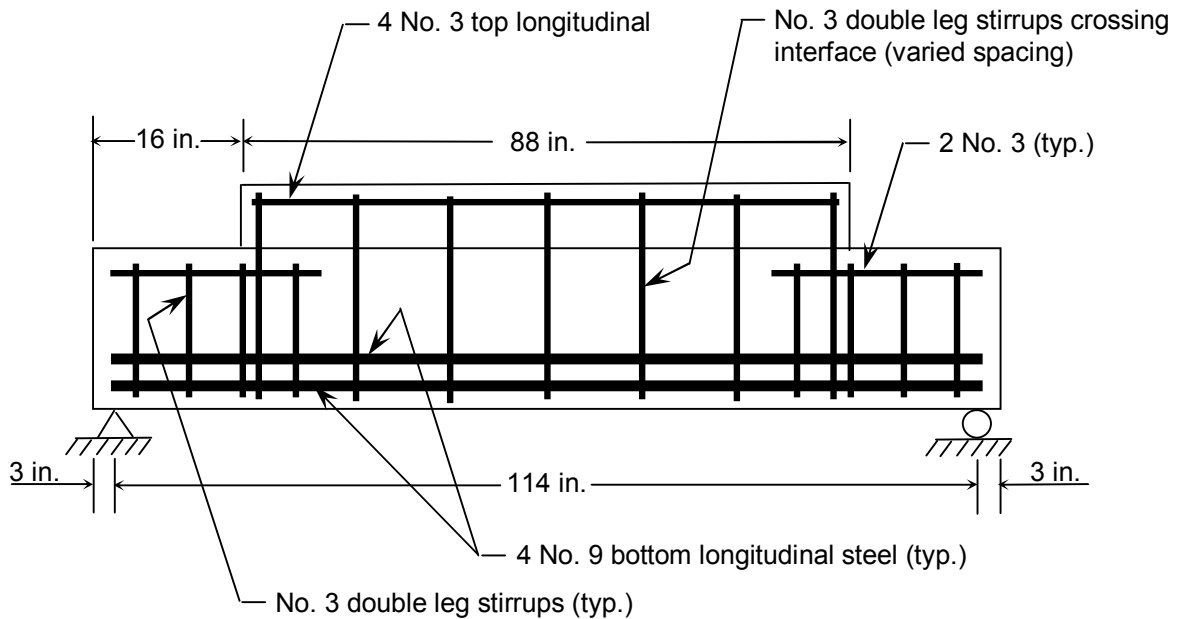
Typical reinforcement for all beams. Note: 1 in. 25.4 mm; No. 3 bar = 10 M; No. 9 bar = 29 M.
